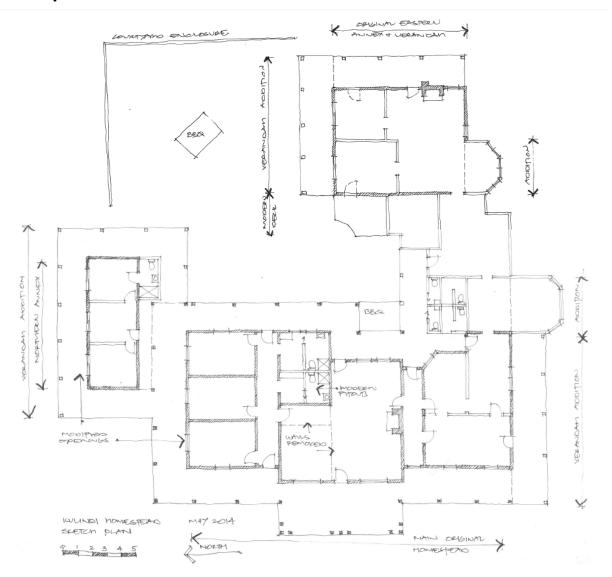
Sketch plan of Kullindi Homestead. (Source: David Hobbes of Philip Leeson Architects, May 2014)
